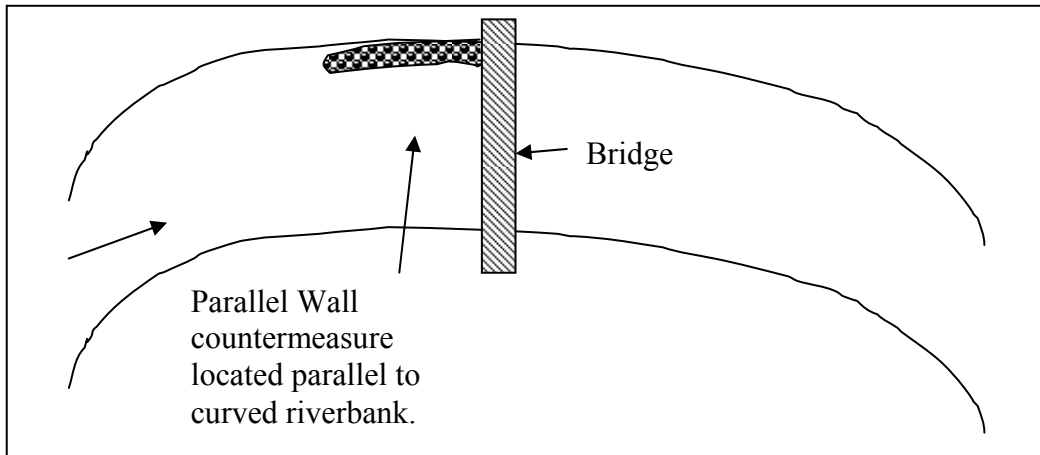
Parallel Wall countermeasure located on river bend. Wall kept parallel to riverbank.
